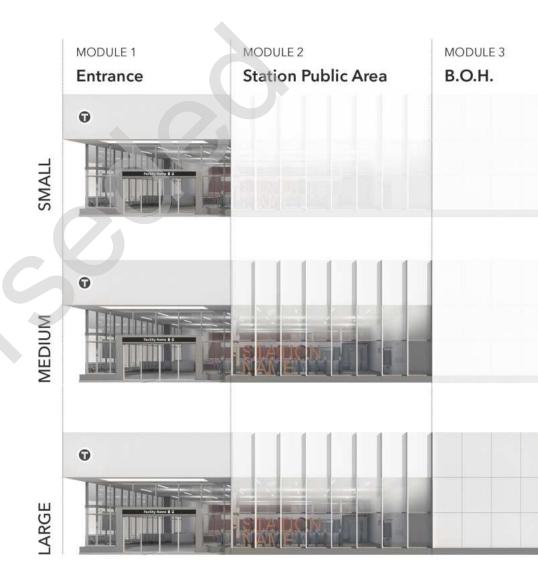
Below grade typology - Kit of parts approach - Elements of station building
